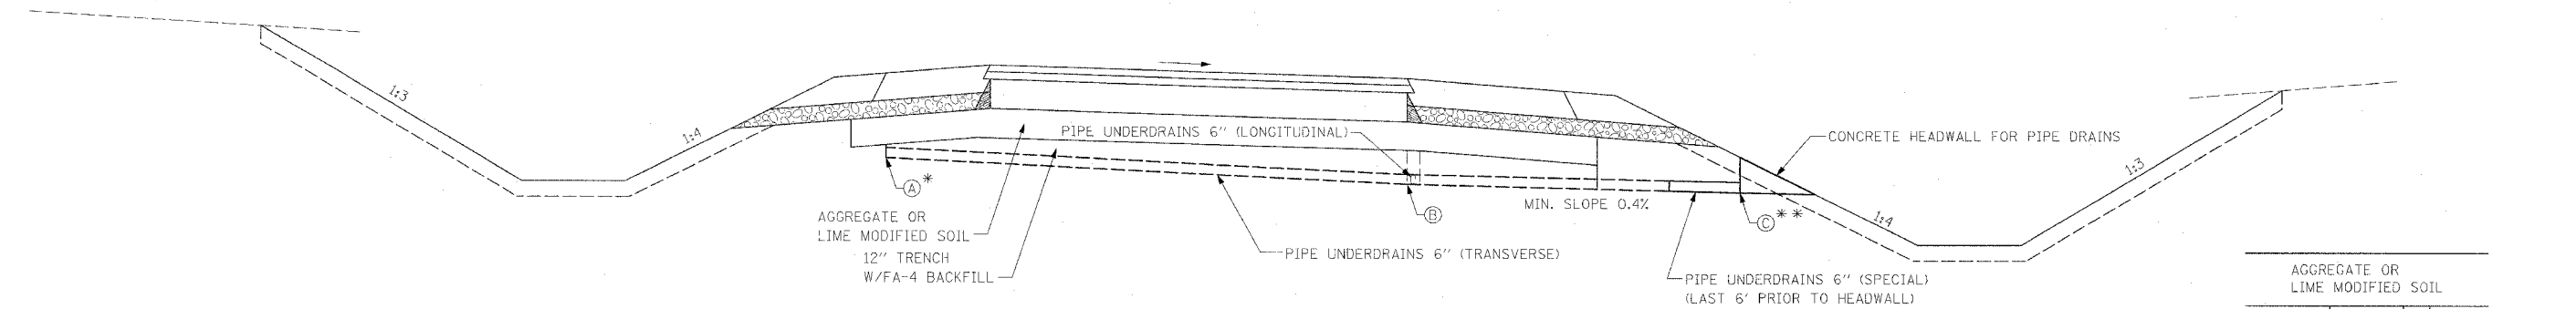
DETAIL - RAMP I PIPE UNDERDRAINS 4" (TRANSVERSE)
